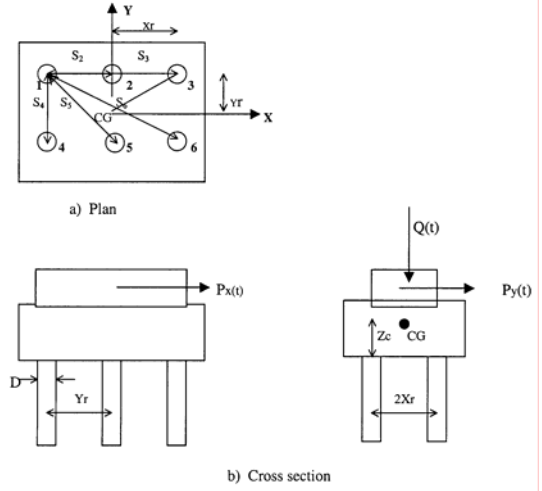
Plan and Cross Section of Pile Group for illustration.
